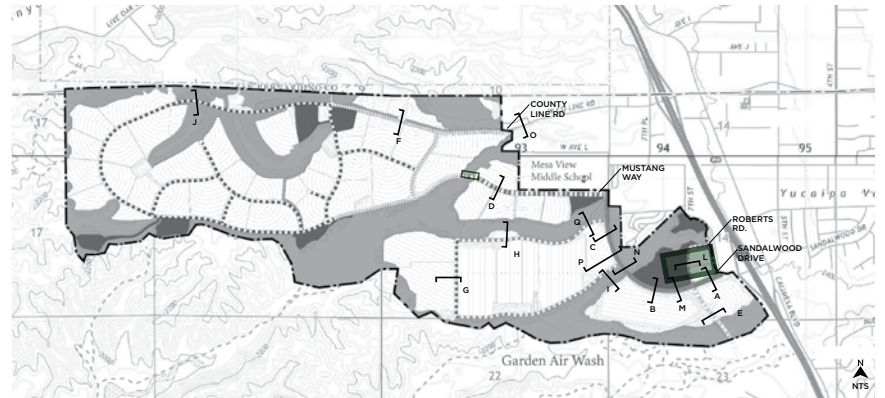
ENLARGEMENT LOCAL STREET SECTION L
